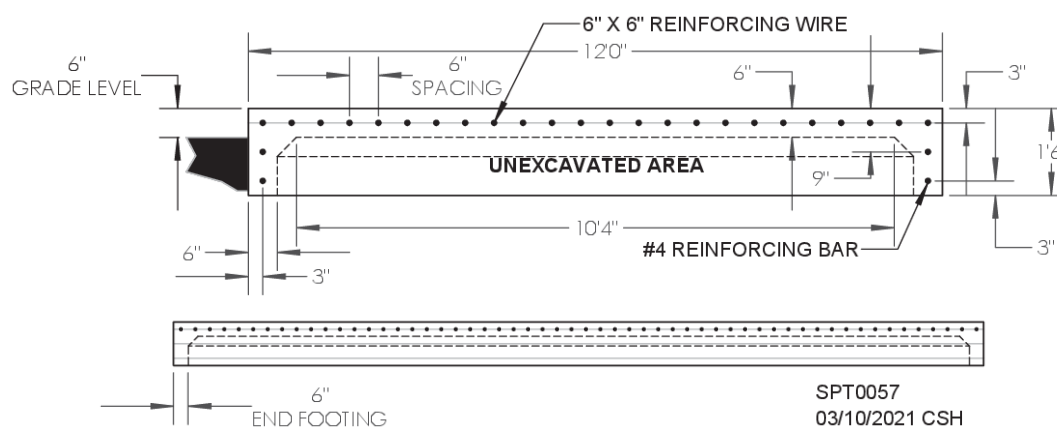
Foundation specifications for single-module axial or centrifugal dryer
